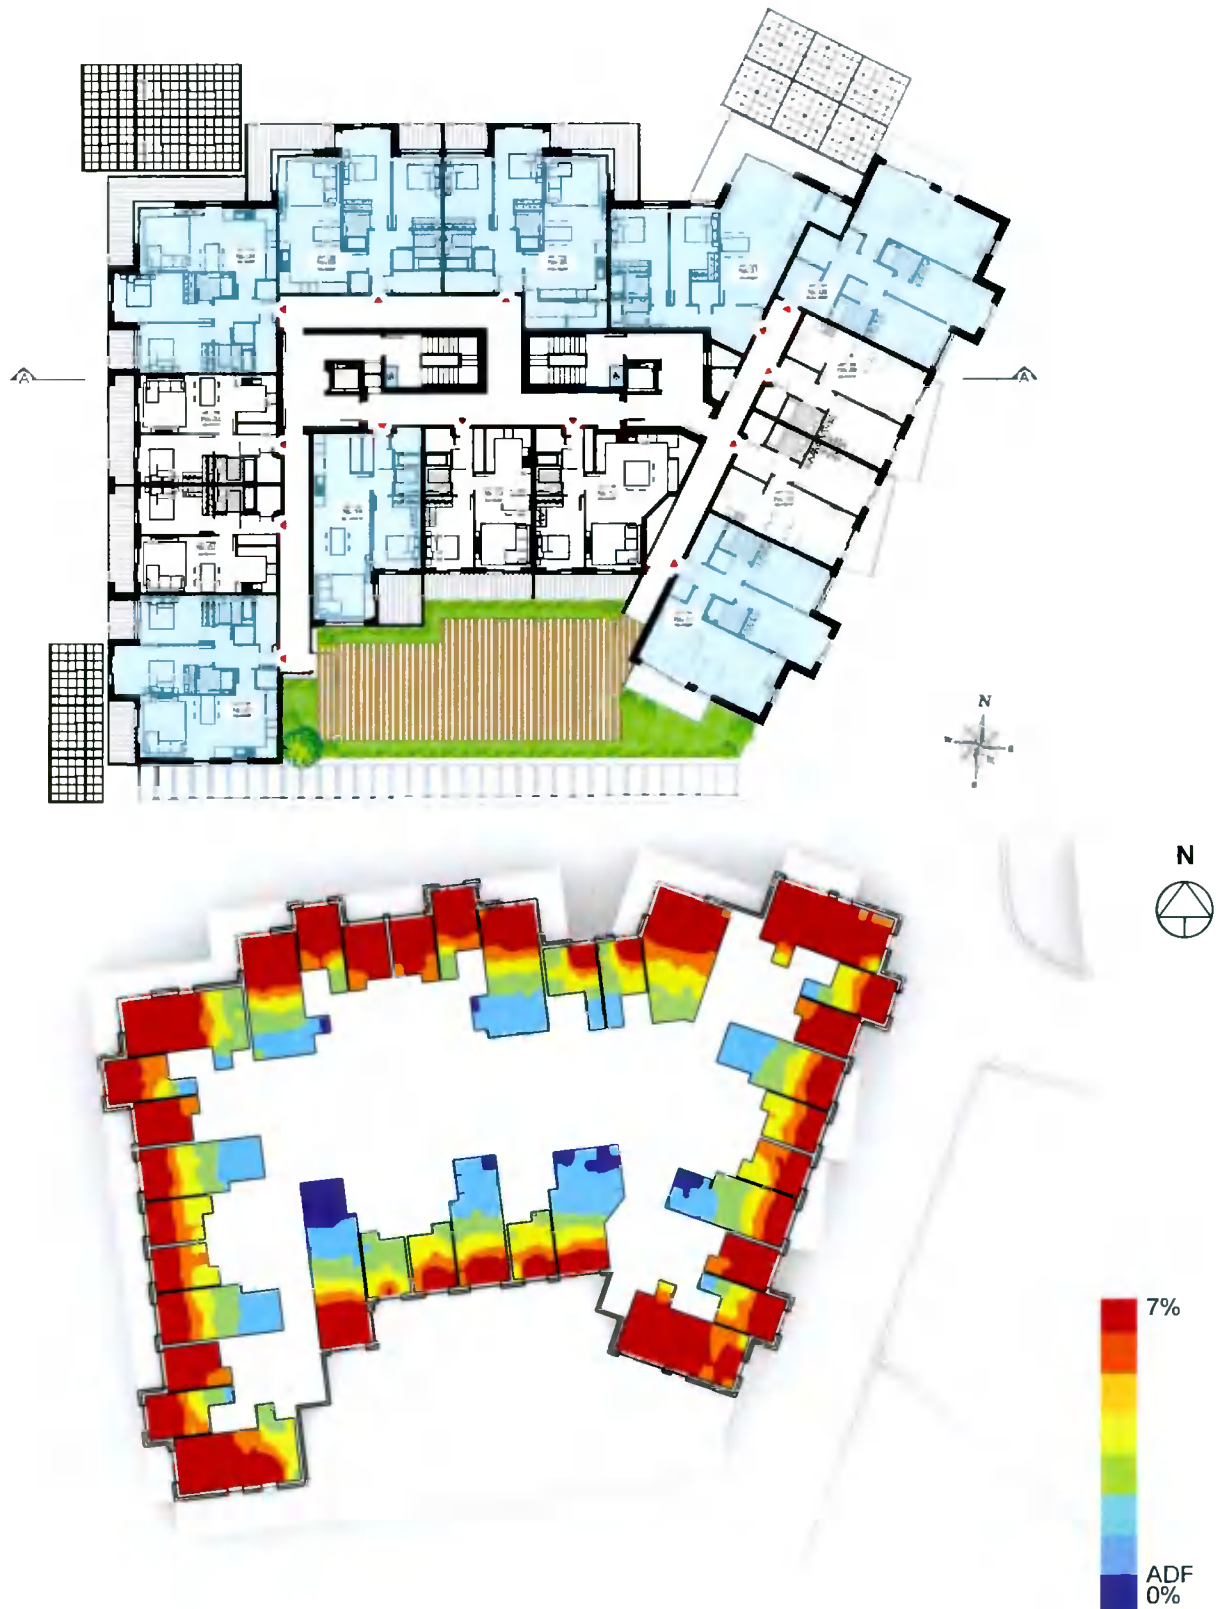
First floor plan locating rooms assessed for ADF, together with false colour plans of ADF. Scale 0 - 7%
